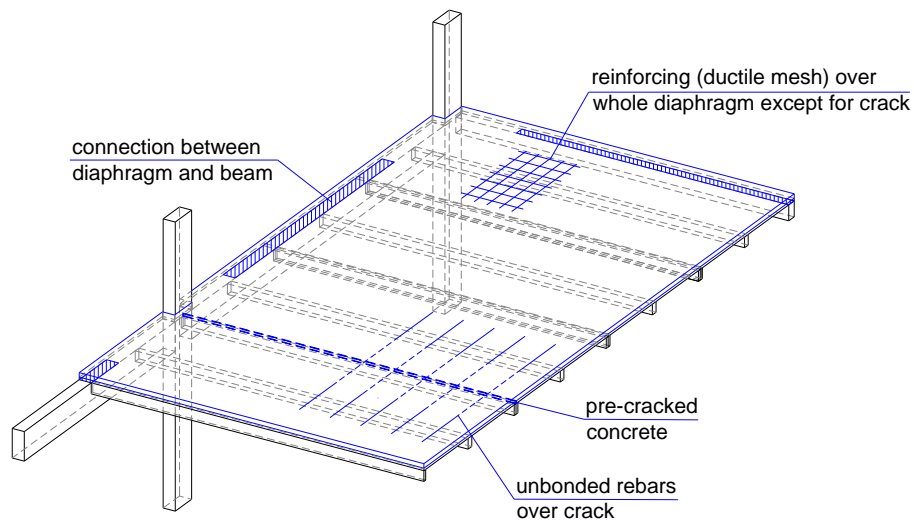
Suggested detailing for a TCC floor in a frame system
